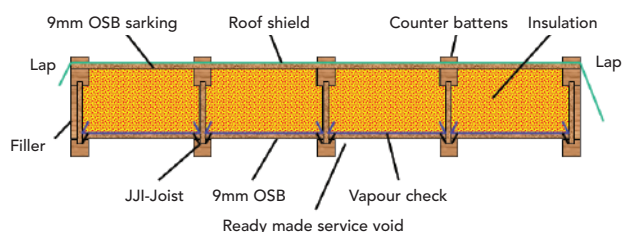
Roof cassette with structural timber I beams. The panel is designed so that the lower flange of the beams form a service void.
